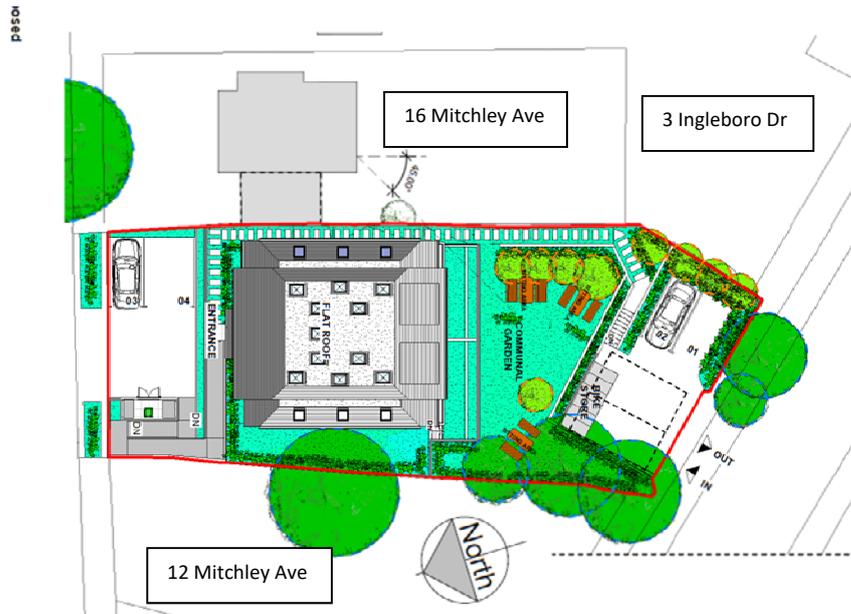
Ground floor plan highlighting the relationship with the adjoining occupiers.
